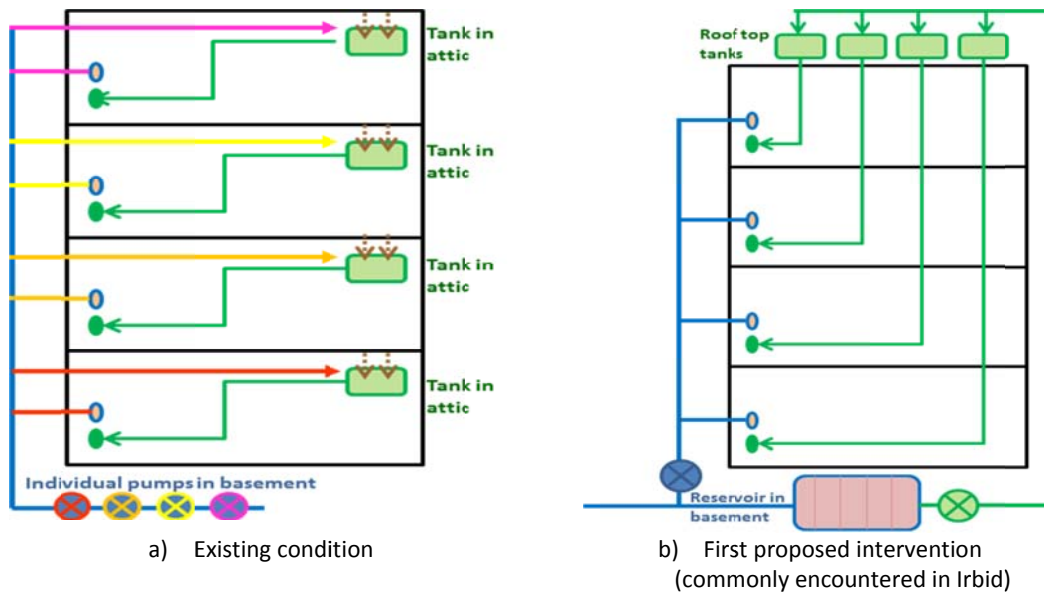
Existing water supply conditions in Tebbaneh and the first proposed intervention
